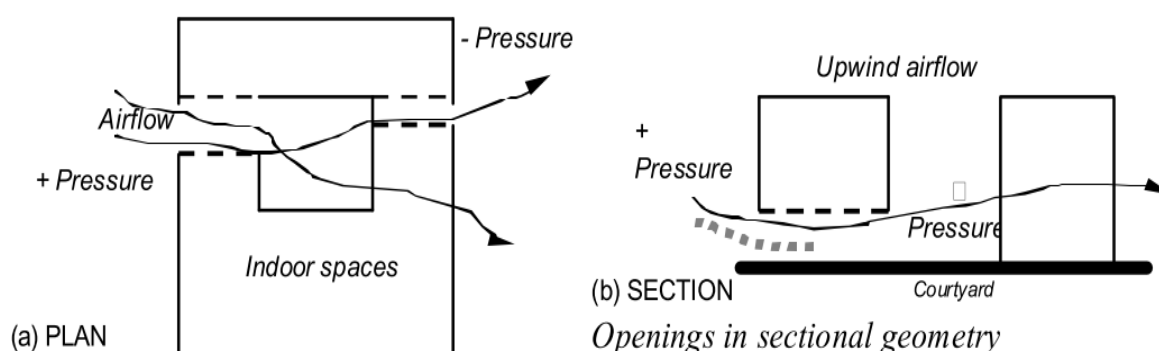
Semi enclosed courtyard acting as an air funnel, wind permeability of plan
